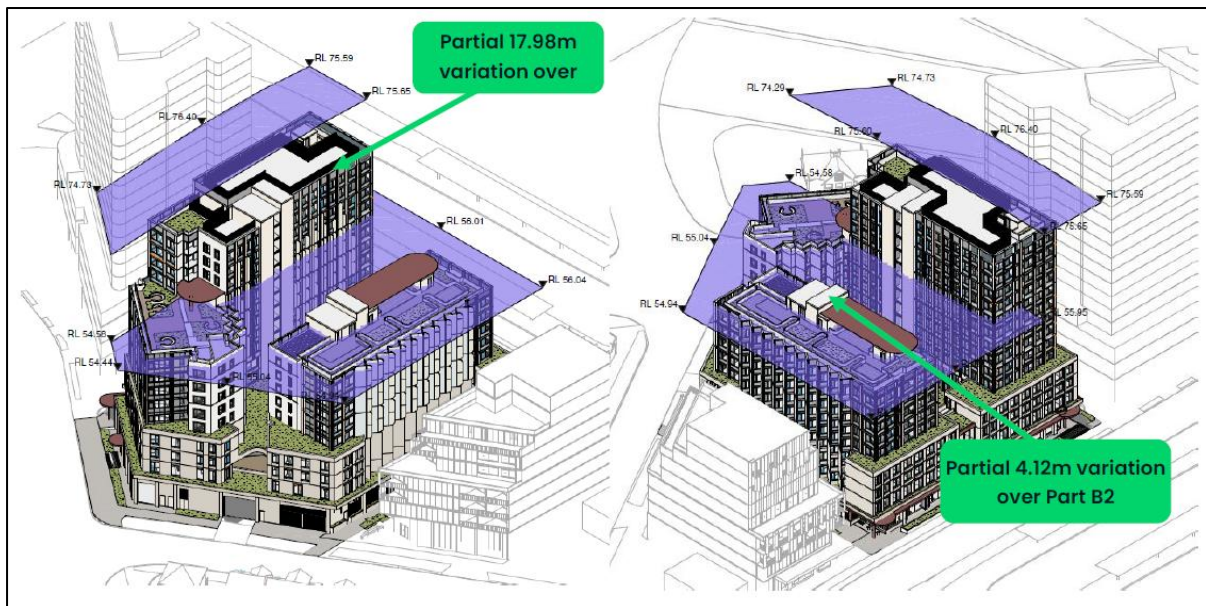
Height plane diagram showing the extent of building height variation (Source: SJB Architecture)
